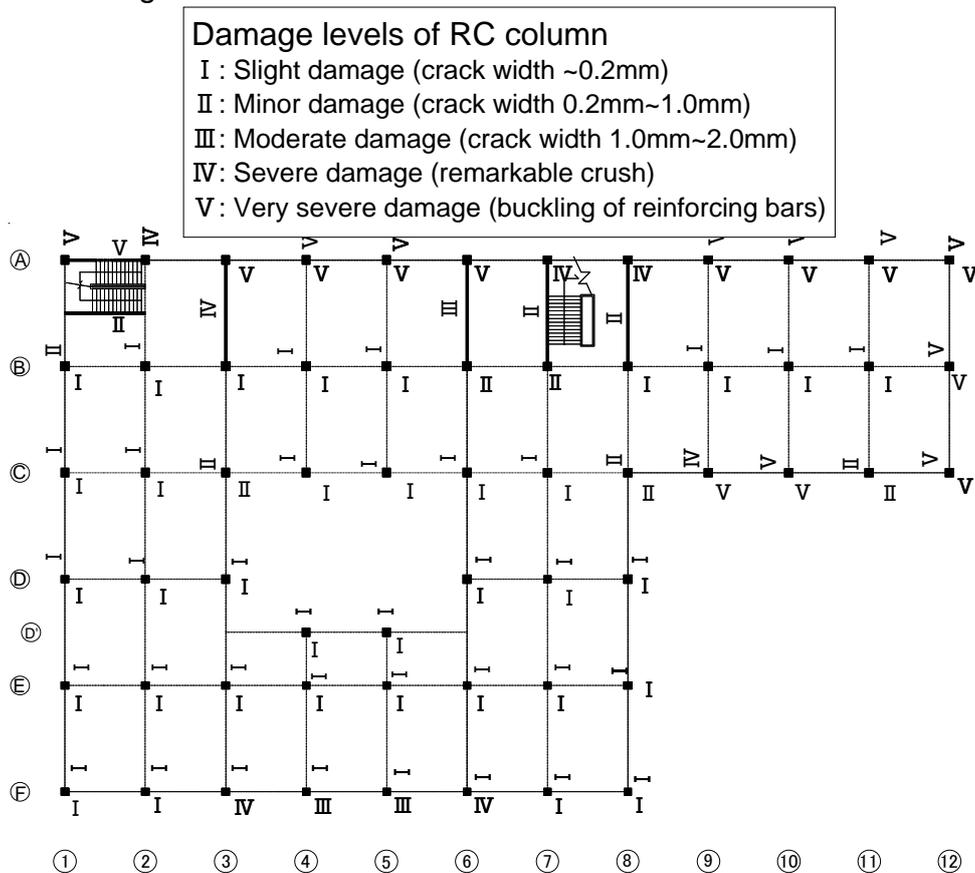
1<sup>st</sup> floor plan and damage levels in columns and walls
